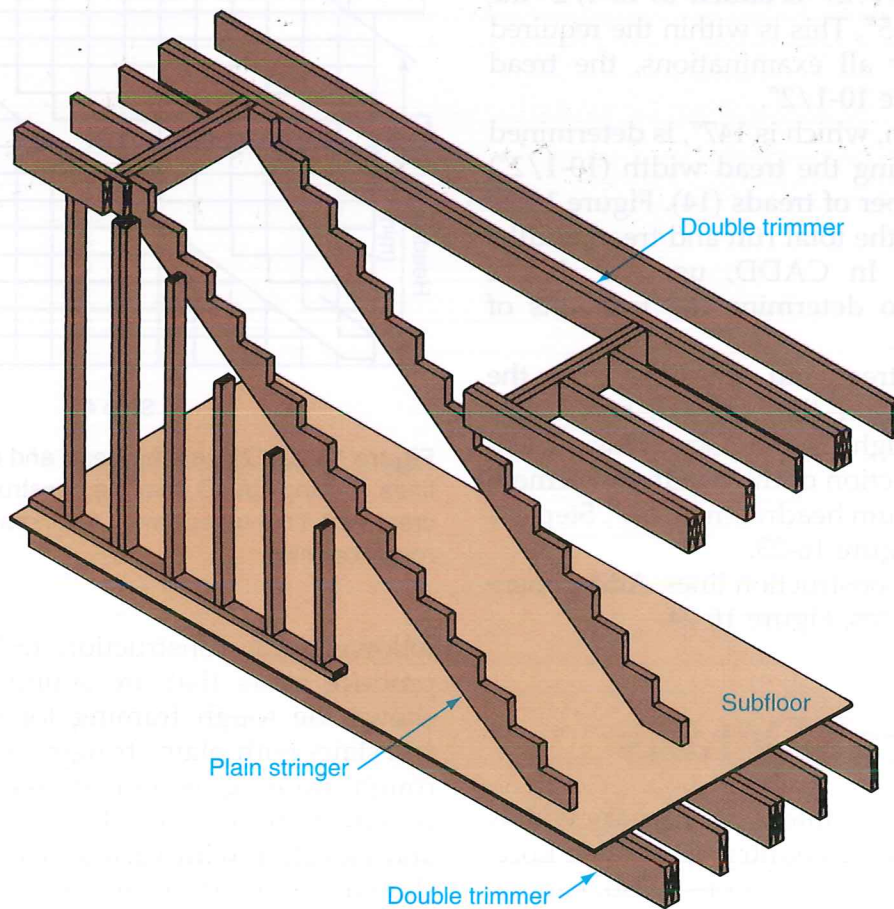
This pictorial drawing shows the rough framing for open, straight run stairs with plain stringers.
